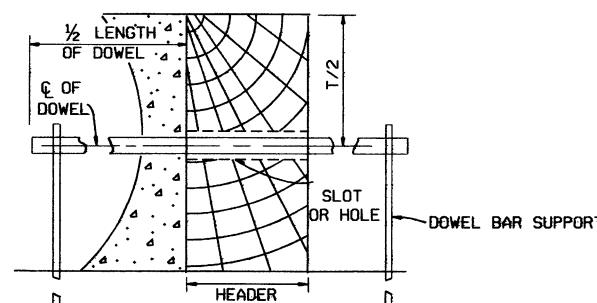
DETAIL OF JOINT SUPPORT FOR EXPANSION JOINTS
